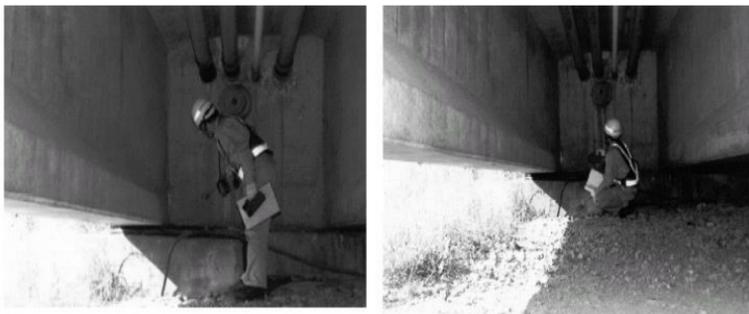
Inspect Concrete Girder at Supporting Point
